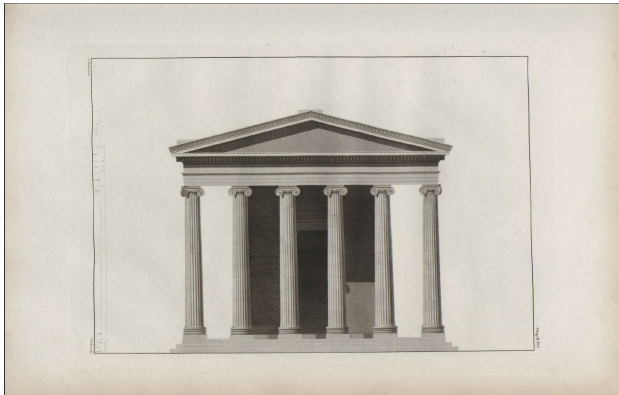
Elevation drawing of the east façade by Pullan (*Antiquities of Ionia* IV, 1881, pl XXIII).
